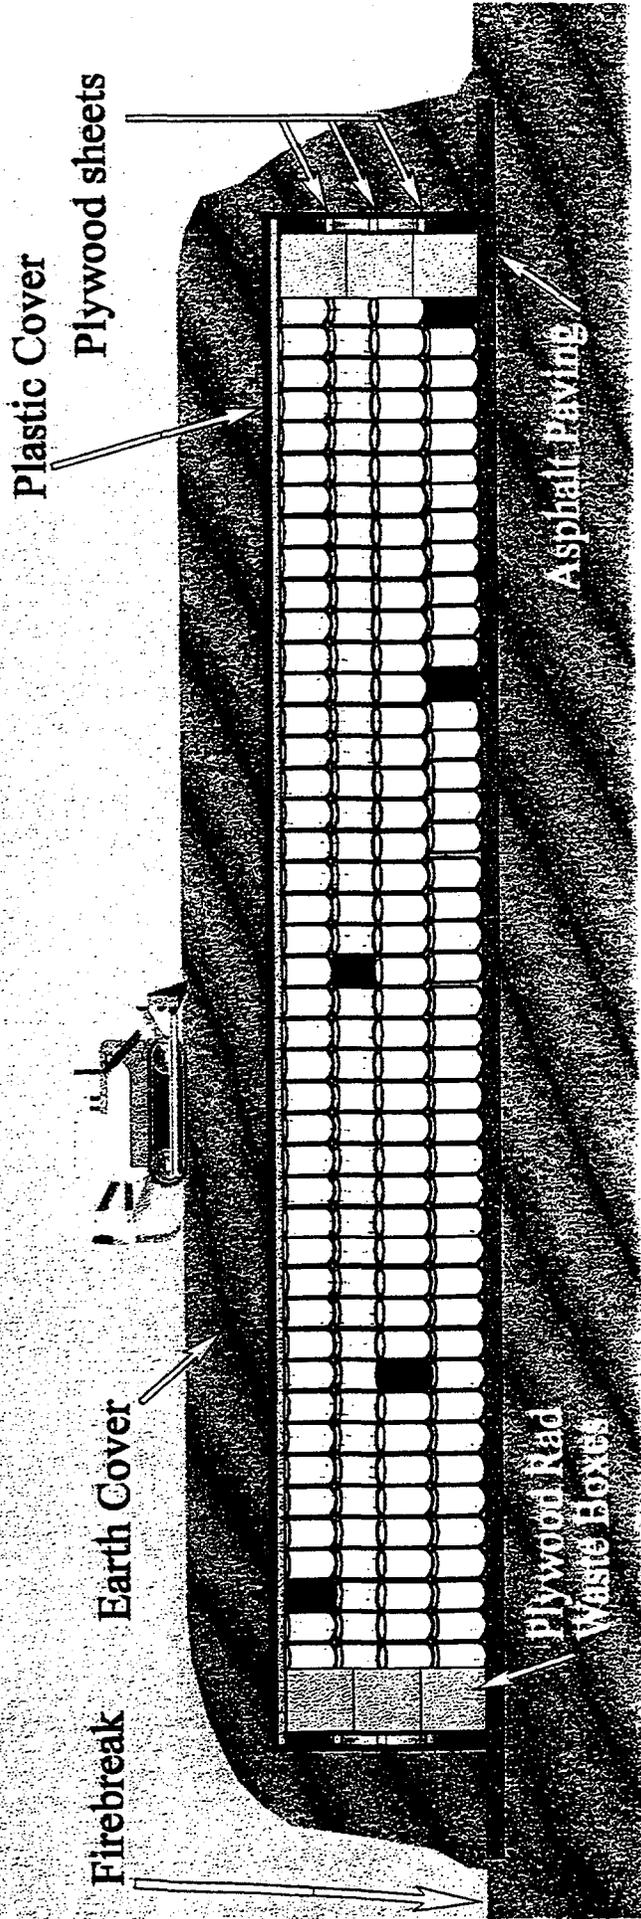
Cross-section of the TSA asphalt storage pad at INEEL.
